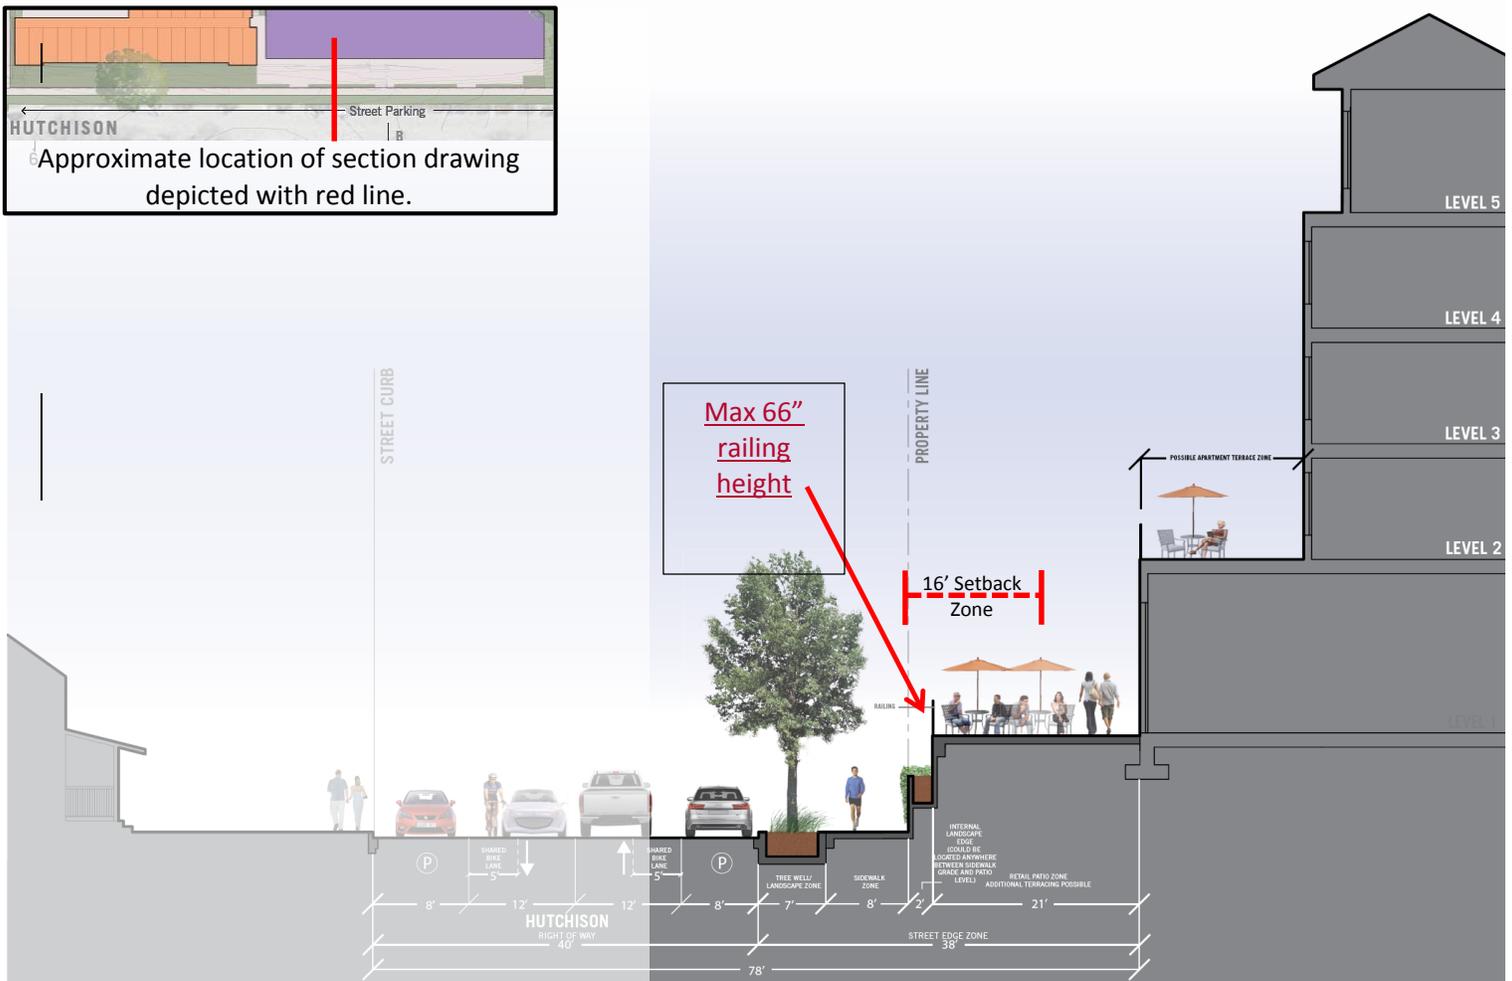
Hutchison Street streetscape design concept adjacent to retail space.
